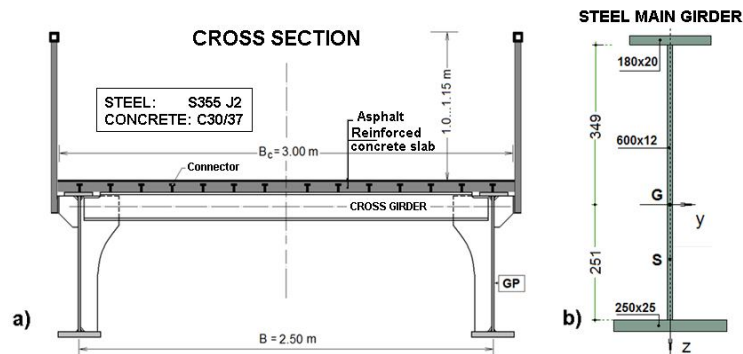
Composite steel concrete welded girder footbridge:
